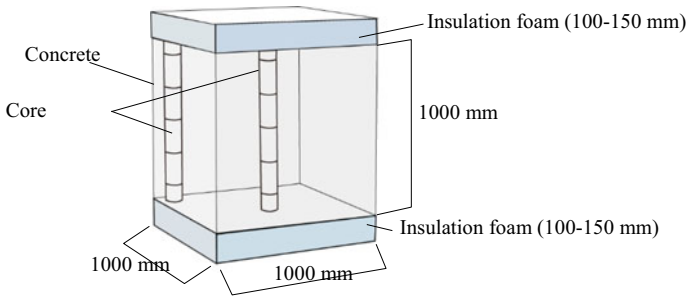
Model of concrete block specimen (JASS 5T-605)
